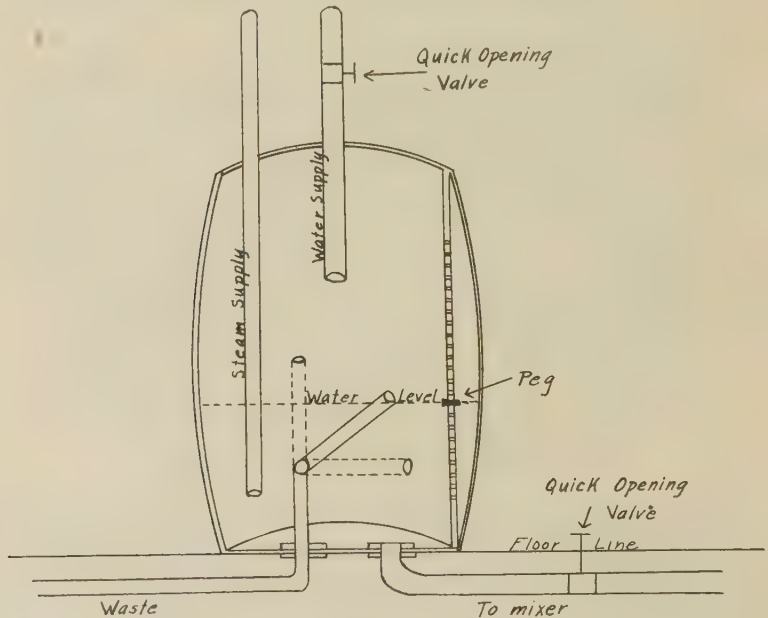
WATER BARREL USED TO CONTROL CONCRETE.
